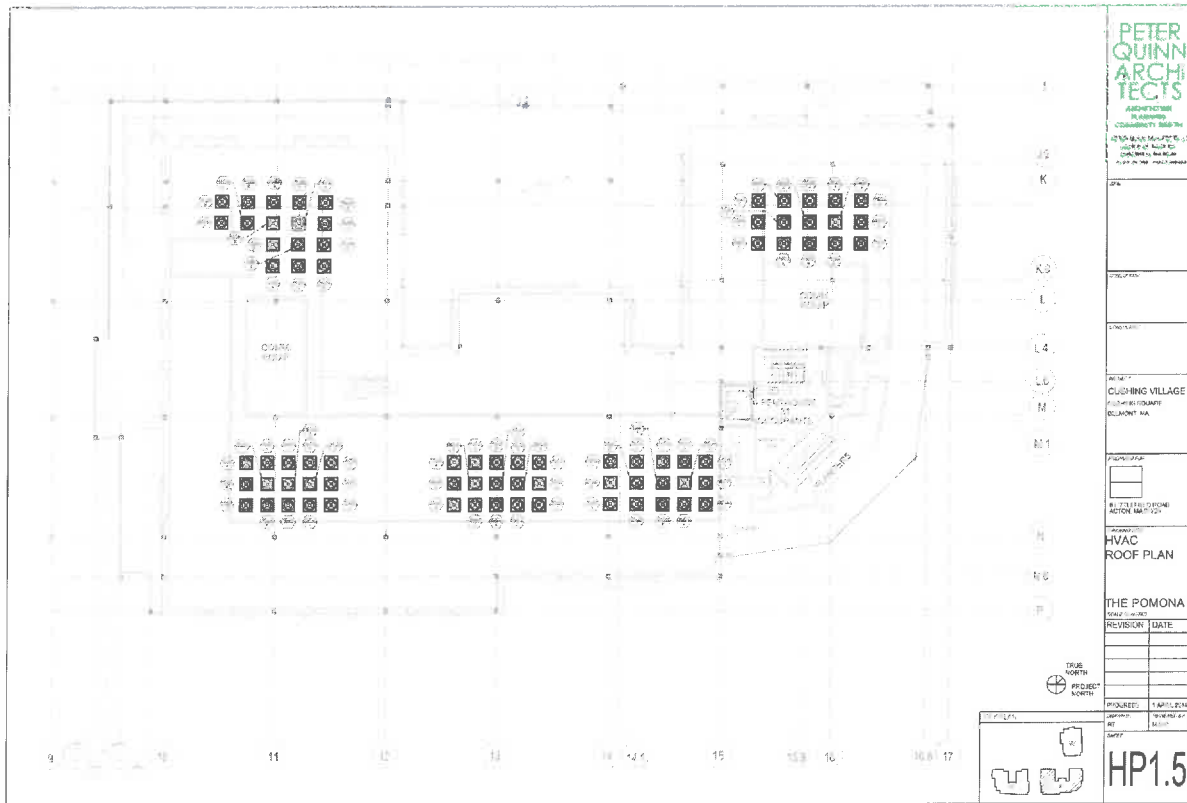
Pomona Building roof plan showing residential compressor/condenser units
